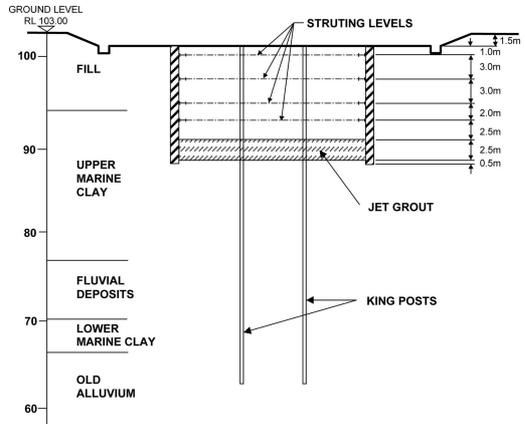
The excavation for the Central Services Tunnel (after Lim & Tan (2003)).
